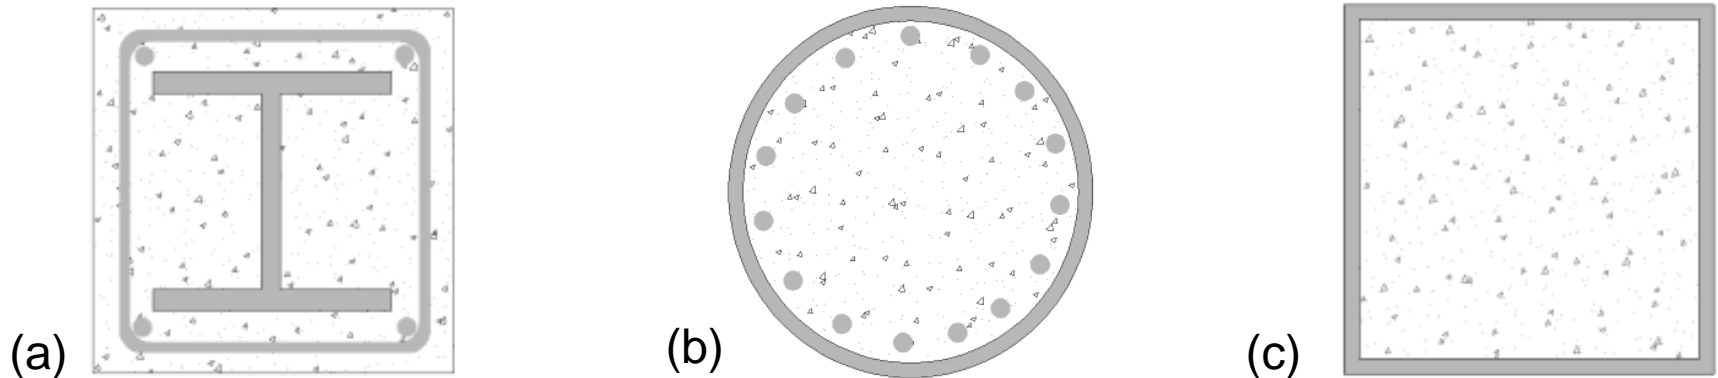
Configuration of composite columns: (a) Structural steel shape fully encased in reinforced concrete; (b) Concrete-filled tube with reinforcement bars; and (c) Concrete-filled tube.
